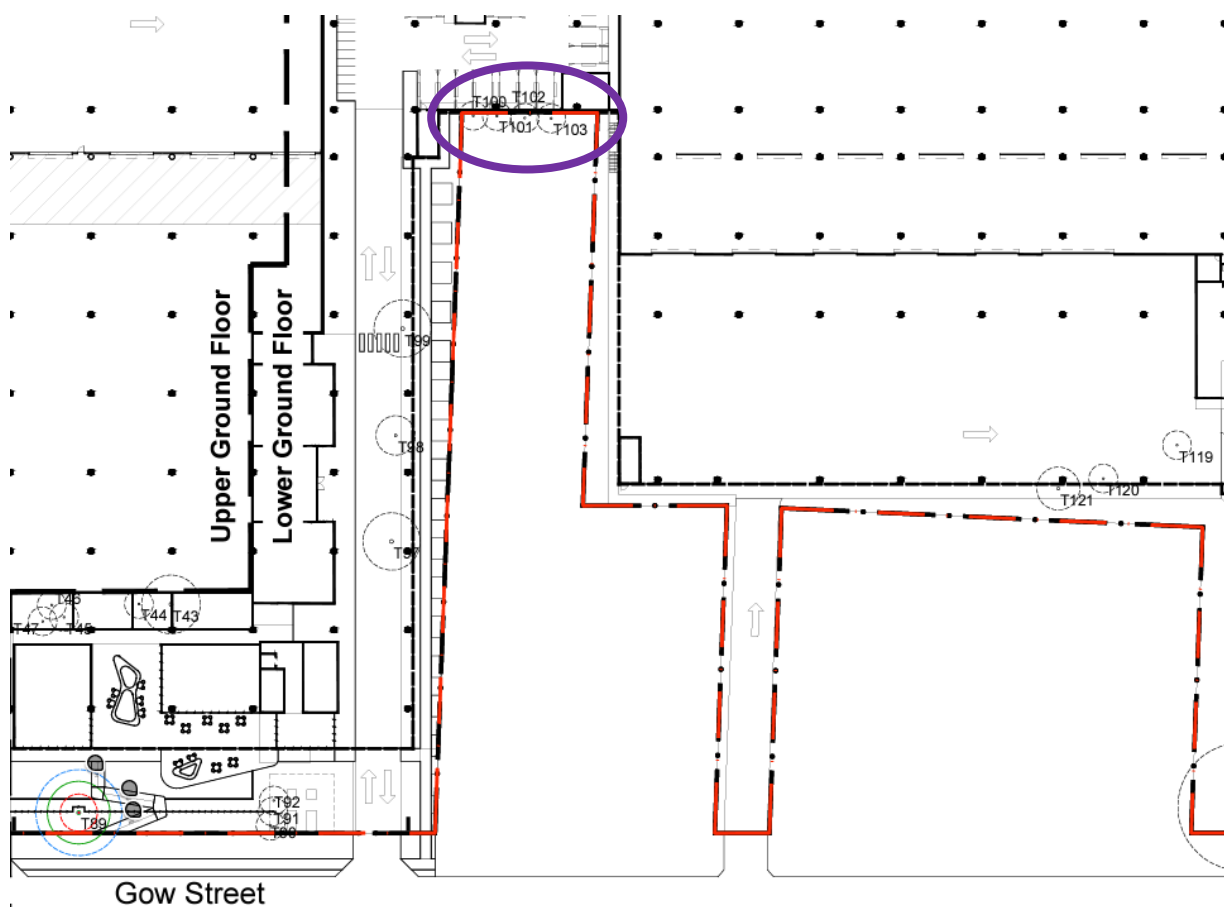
Tree Removal and Retention Plan (Source: Site Image Landscape Architects)
